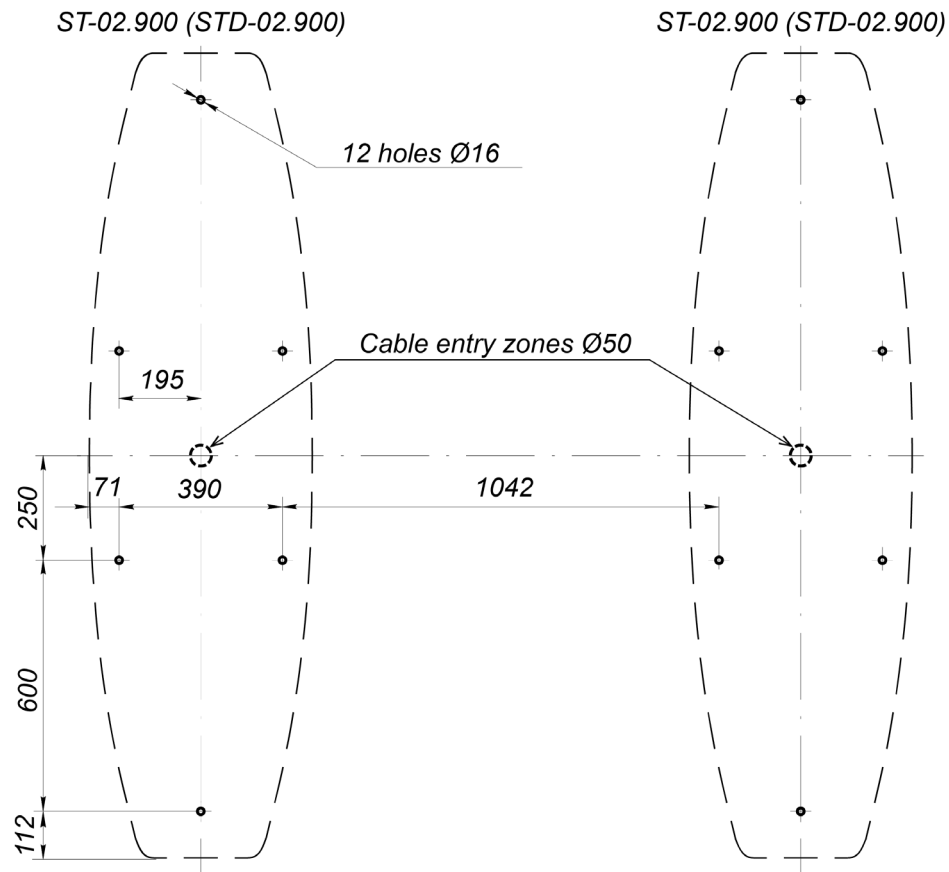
Layout for installation of the sections with the passageway width of 900 mm (ST-02.900, STD-02.900)
